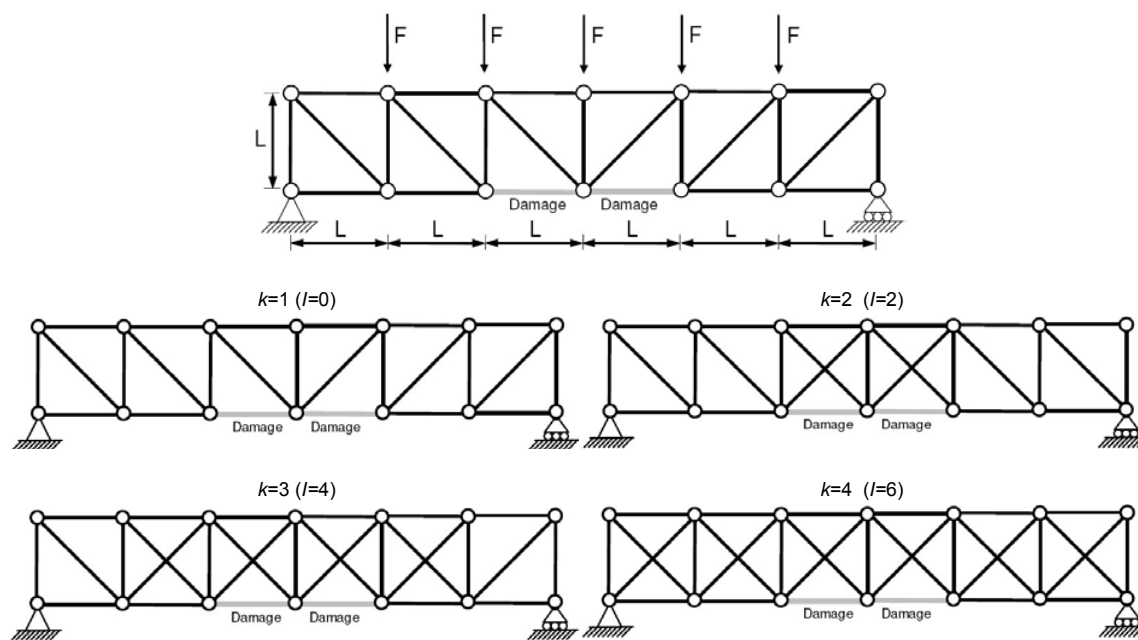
MIXED SERIES-PARALLEL TRUSS SYSTEMS UNDERGOING DAMAGE OF TWO MEMBERS.
